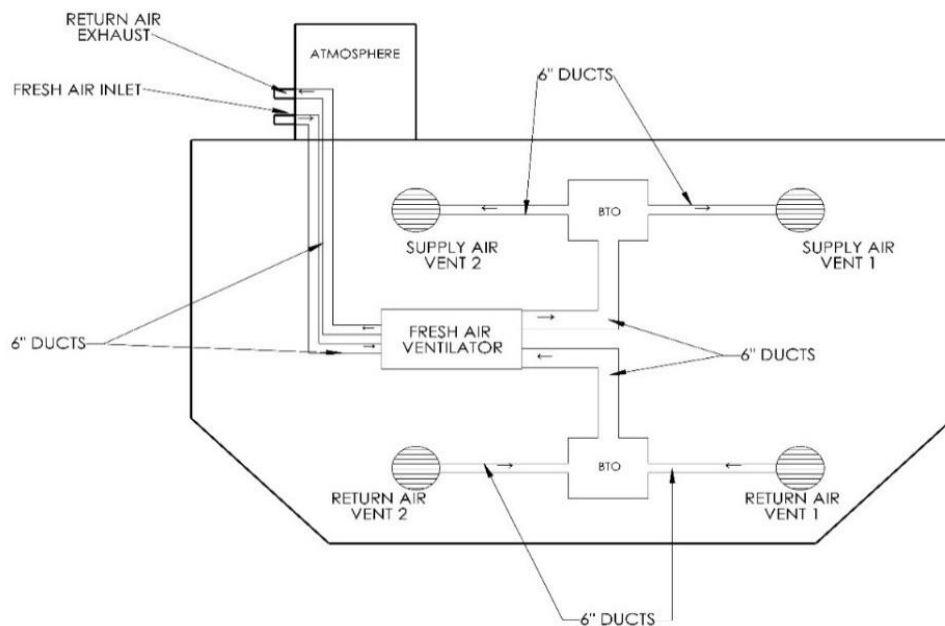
Typical installation (plan) layout of the supplementary ventilation system
